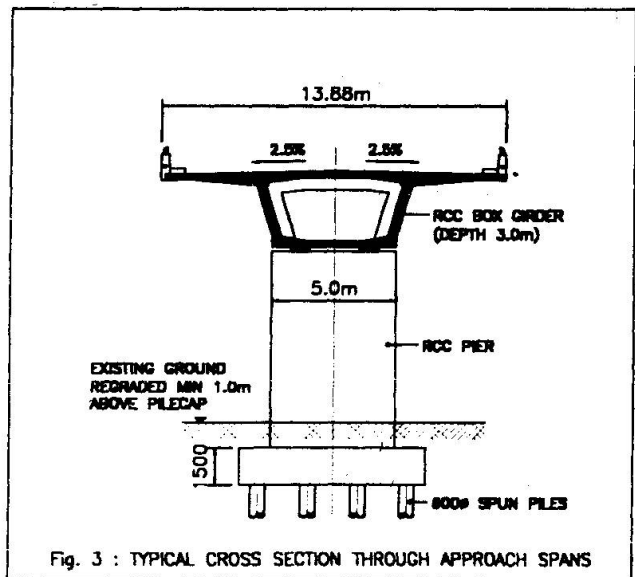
TYPICAL CROSS SECTION THROUGH APPROACH SPANS
